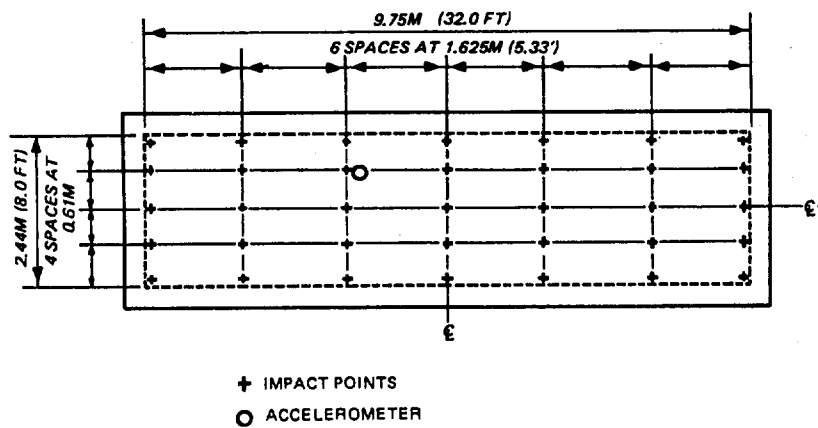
Roof Plan Showing Impact Point and Accelerometer Locations
